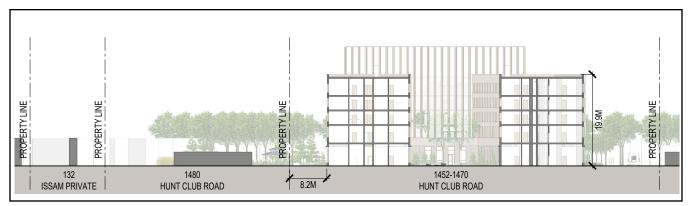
East-west cross section adjacent to Hunt Club Road looking south, noting 8.2m setback from property line
